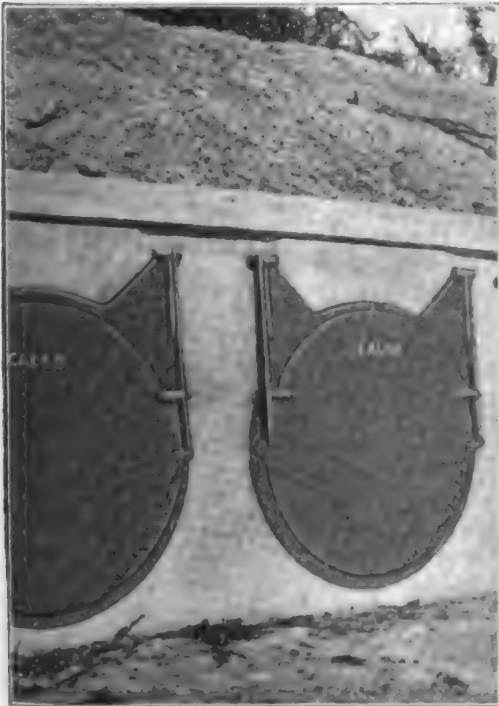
A close-up view of the 60-inch Calco automatic drainage gates installed in the Clarendon Levee District.
